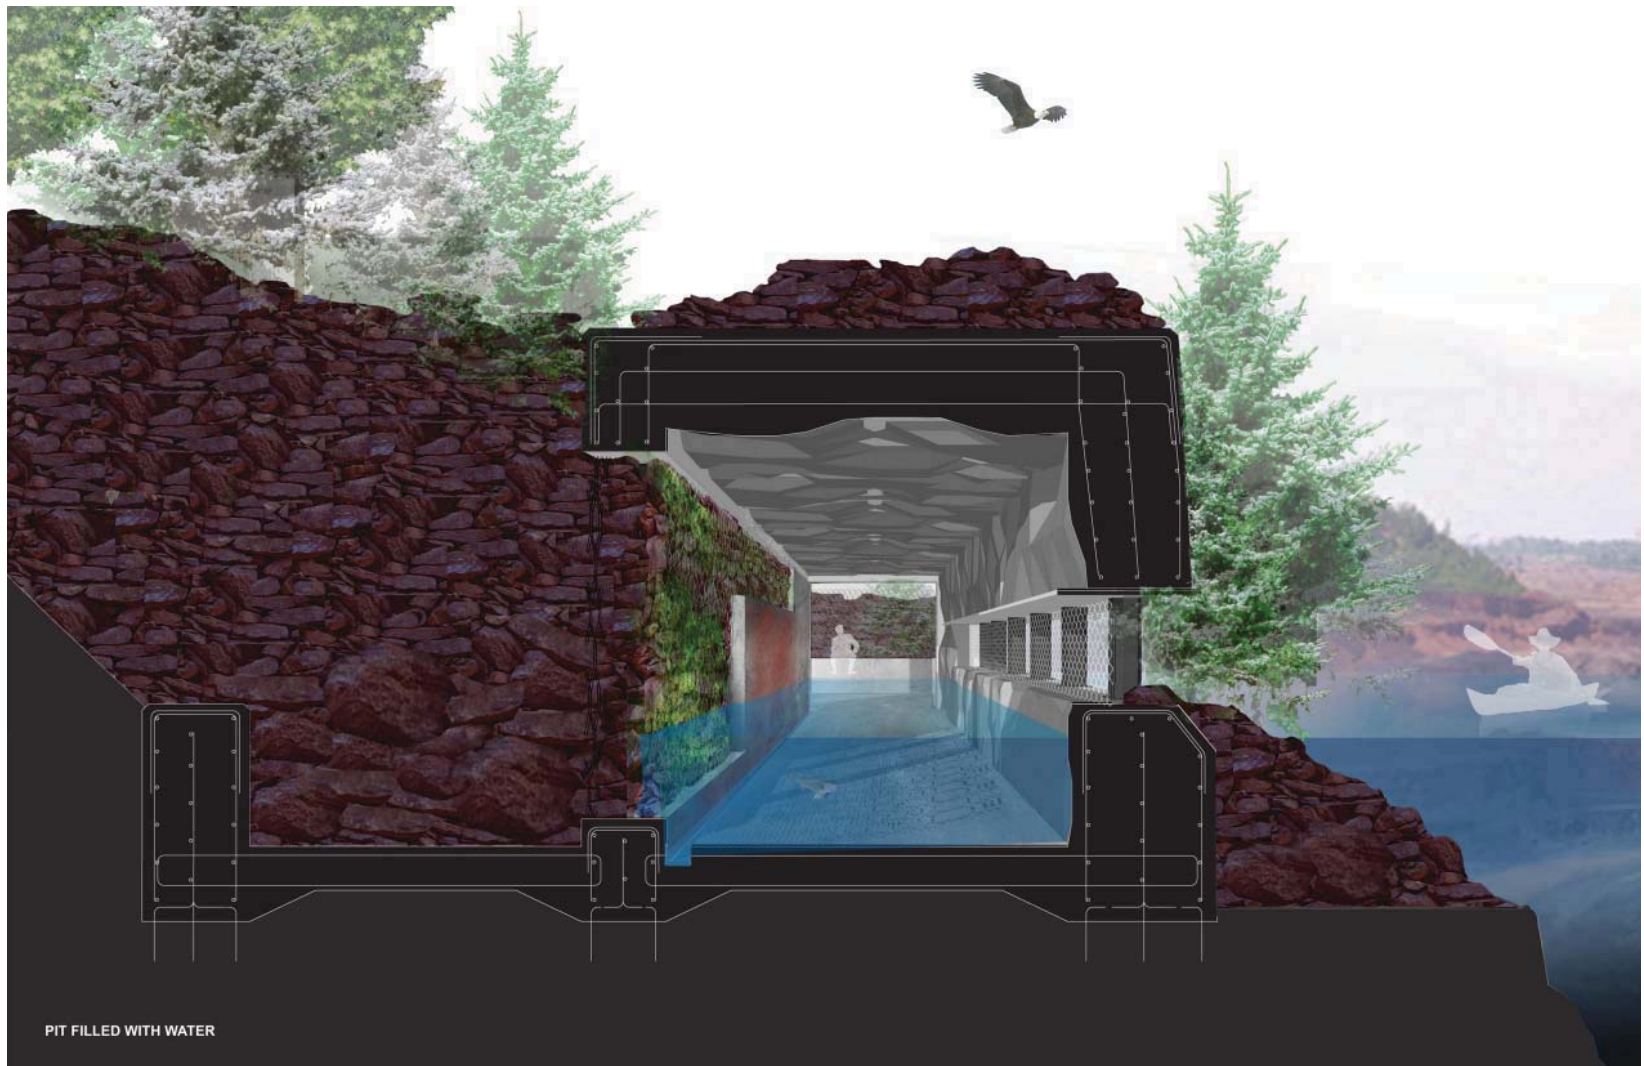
Blast Shelter Section After Mining Activity has Ended.
